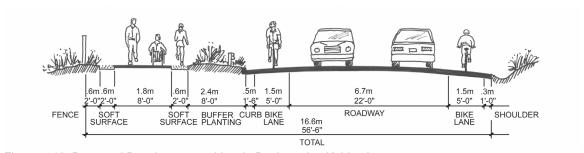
Proposed Development at Lincoln Boulevard at Kobbe Avenue
